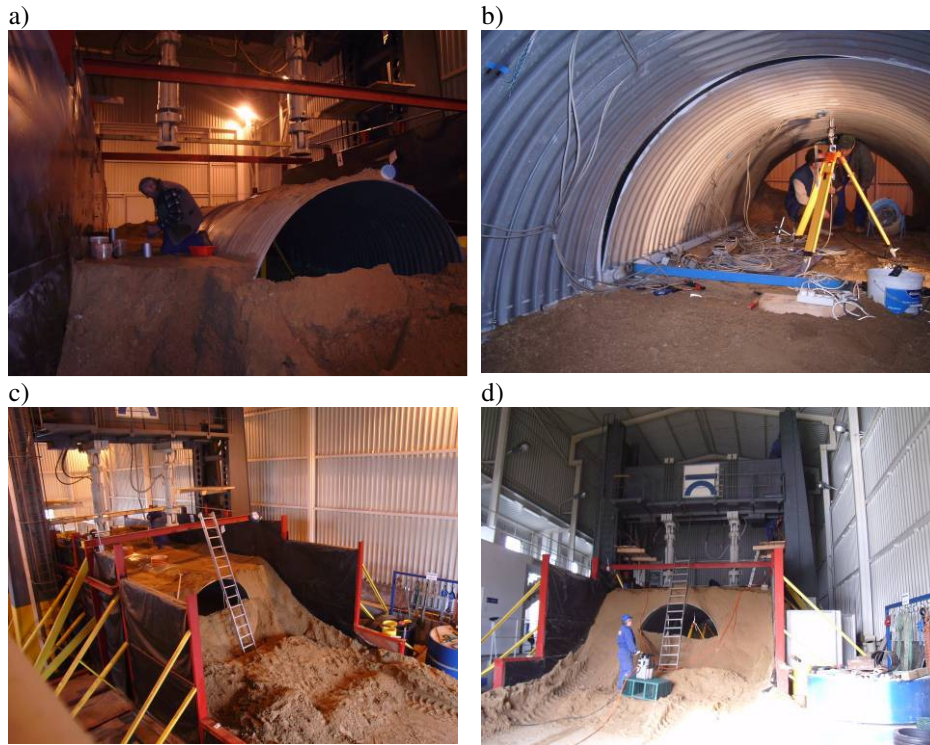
a) testing of degree of compaction; b) installation of measurement gauges; c) backfilling procedure; d) structure before slope pavement using cobblestones
